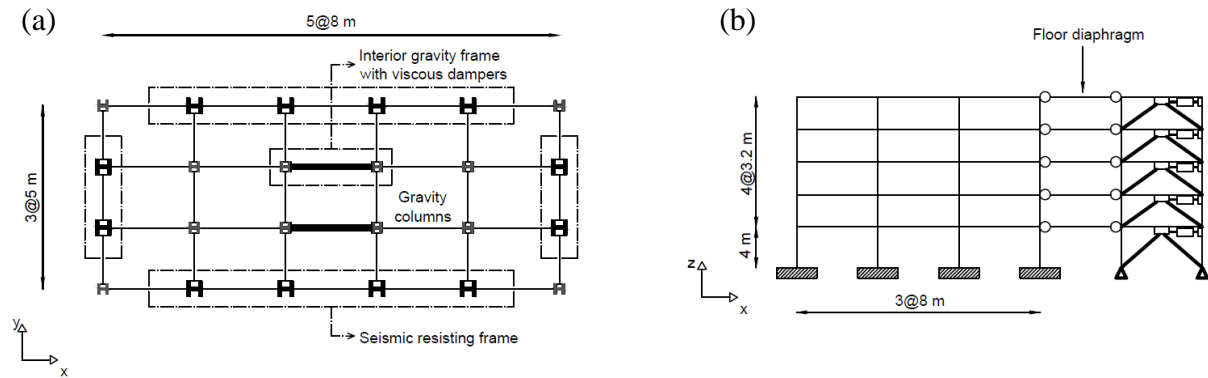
(a) Plan and (b) elevation view of the prototype building.
